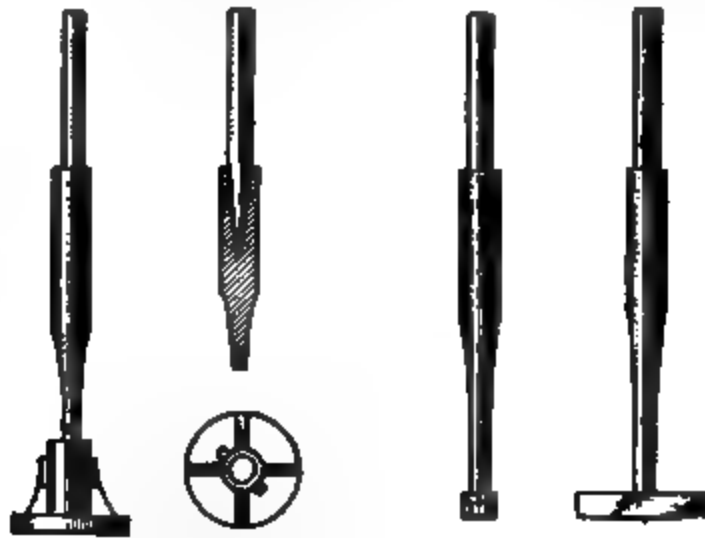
TAMPERS FOR ASPHALT PAVEMENTS.
